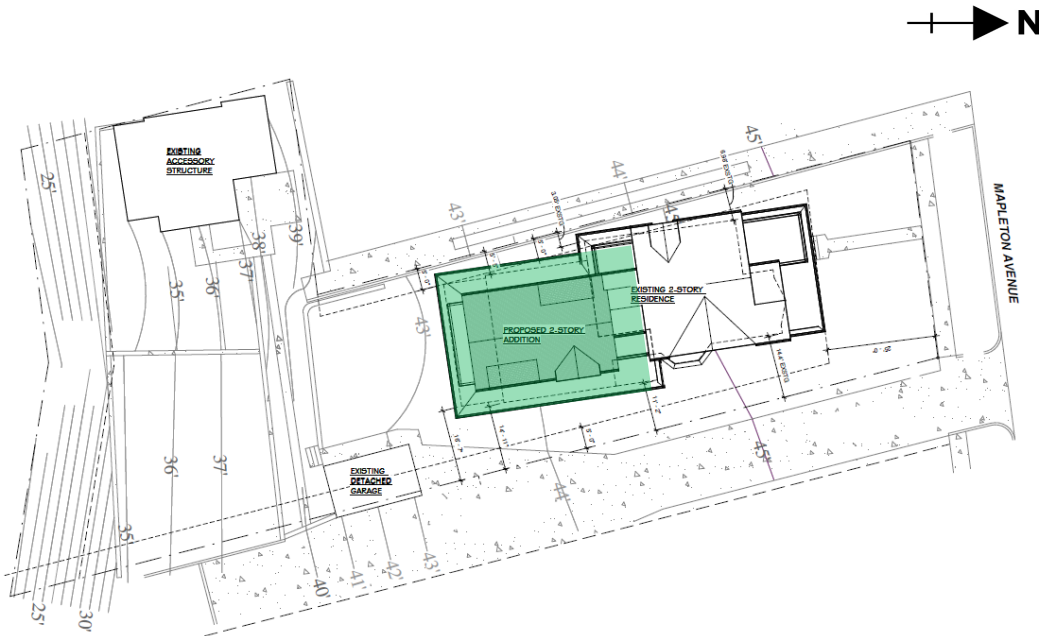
936 Mapleton Ave., proposed site plan (proposed new construction in green).
